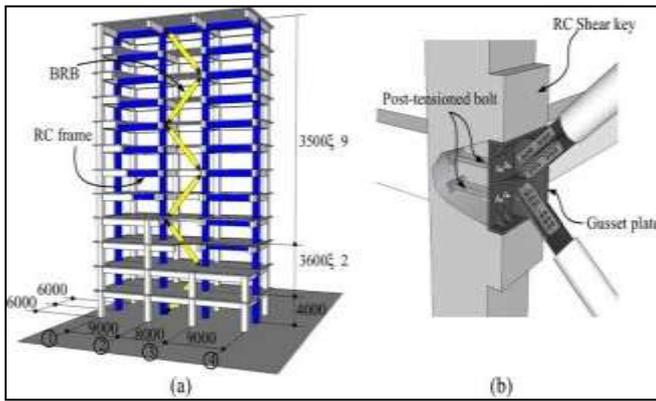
Arrangement and Joint between RCC structure and Steel Bracing
